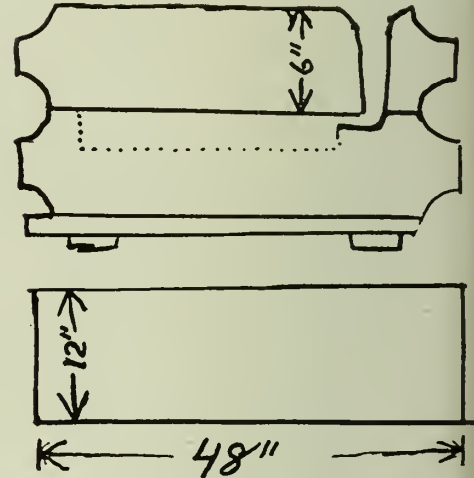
SHOWING MOLD WITH CORE IN POSITION.
